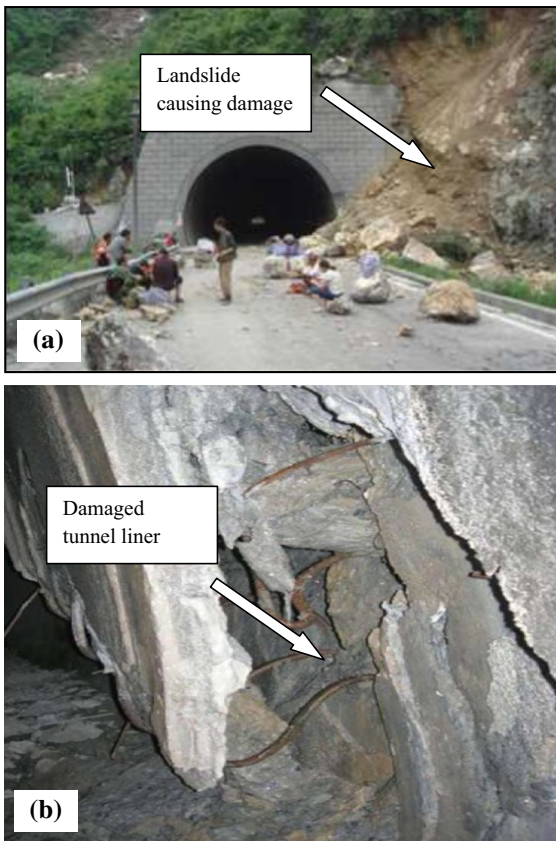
Damages at Baiyunding tunnel (modified after Tao et al. 2011): a portal section damage due to landslide, b sheared off tunnel liner
